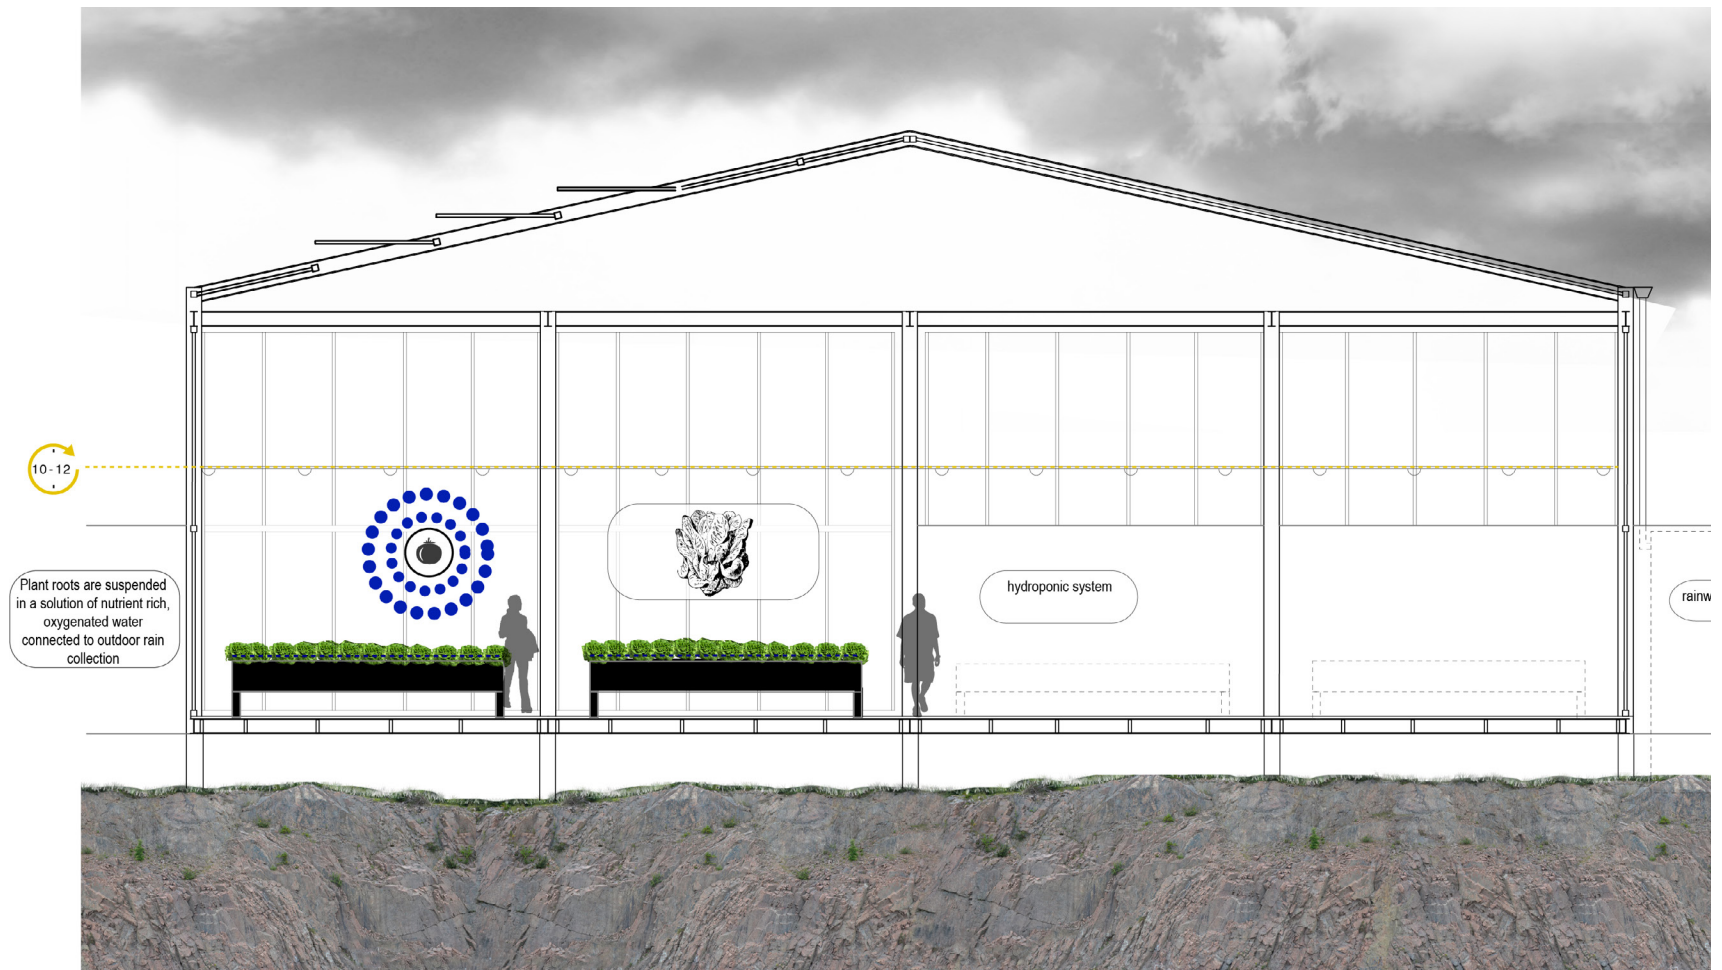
Section 3a: section through hydroponic greenhouses
